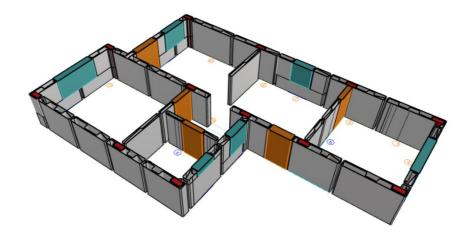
Walls, Columns, and Openings Arrangement Plan (URL 30)
